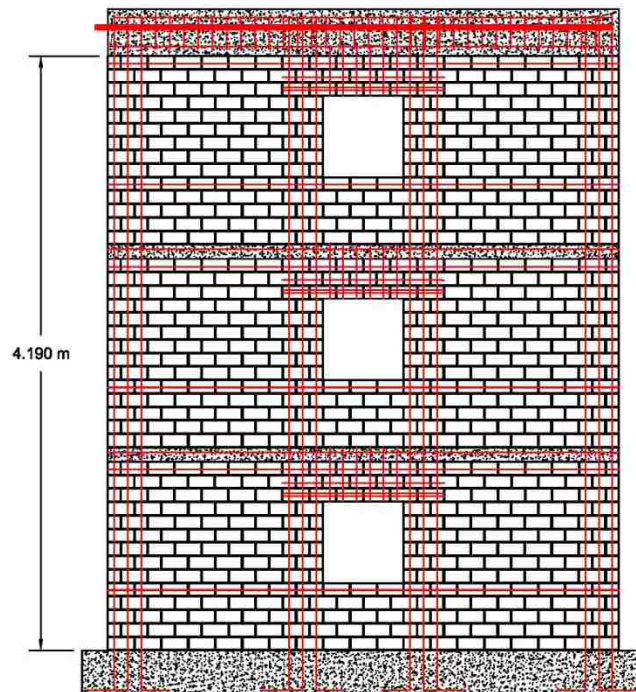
Geometry and Reinforcement Details of Wall 10
